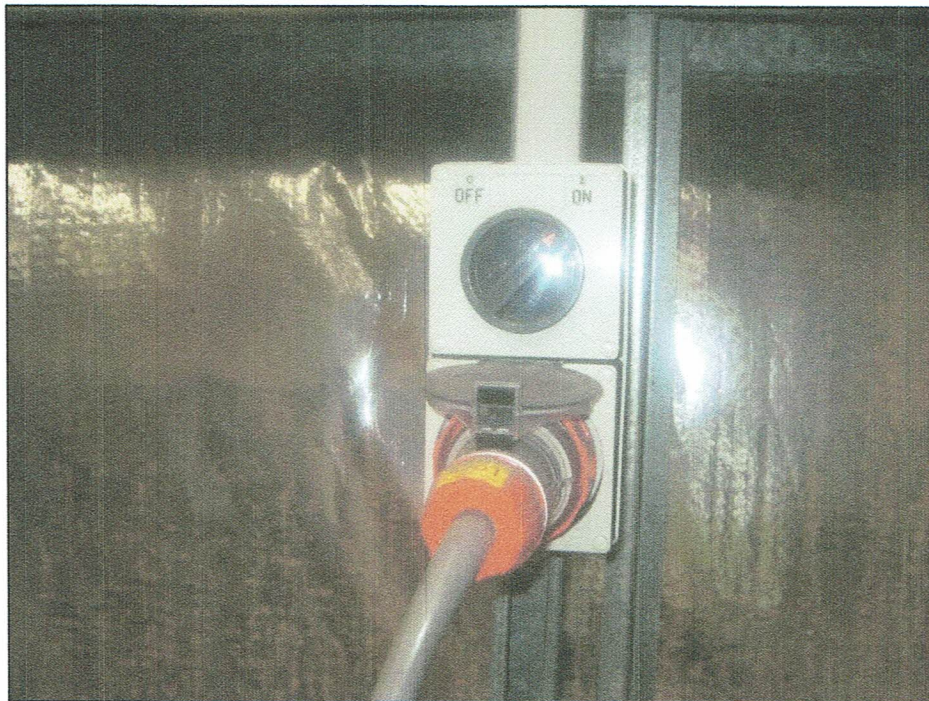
XEKL 455 MT: Wall plug and socket with electrical switch
